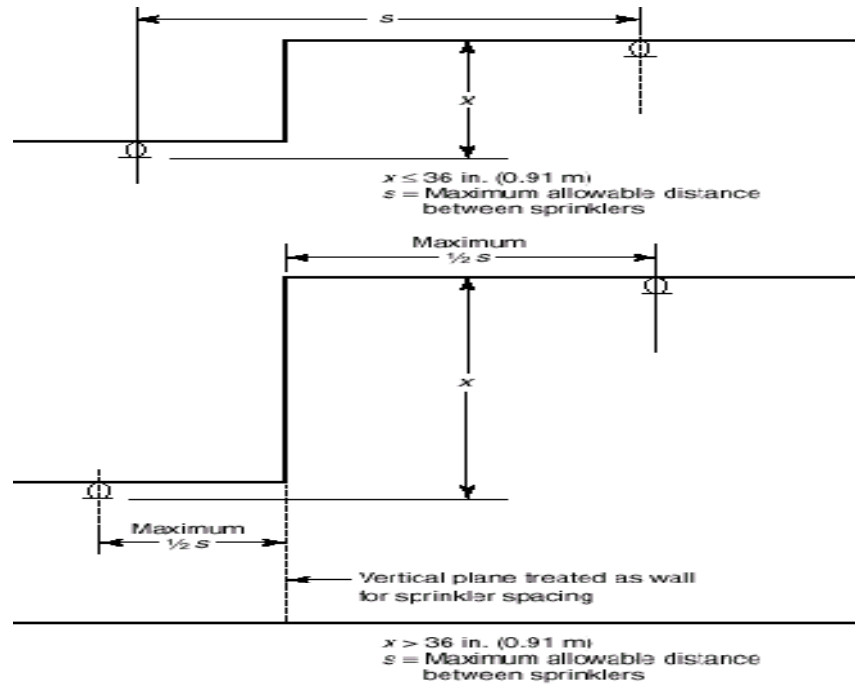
Vertical Changes in Ceiling Elevations, (NFPA 13, 2006).
